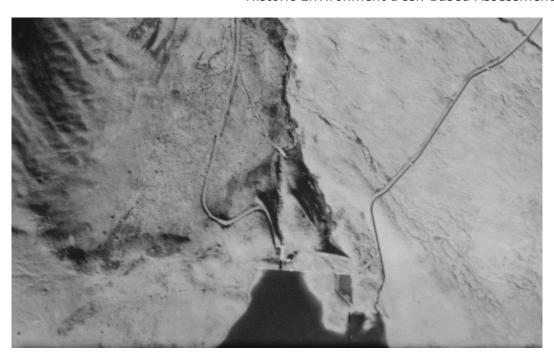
The Valve House and Filter Beds under construction. (Peter Davies Collection).
